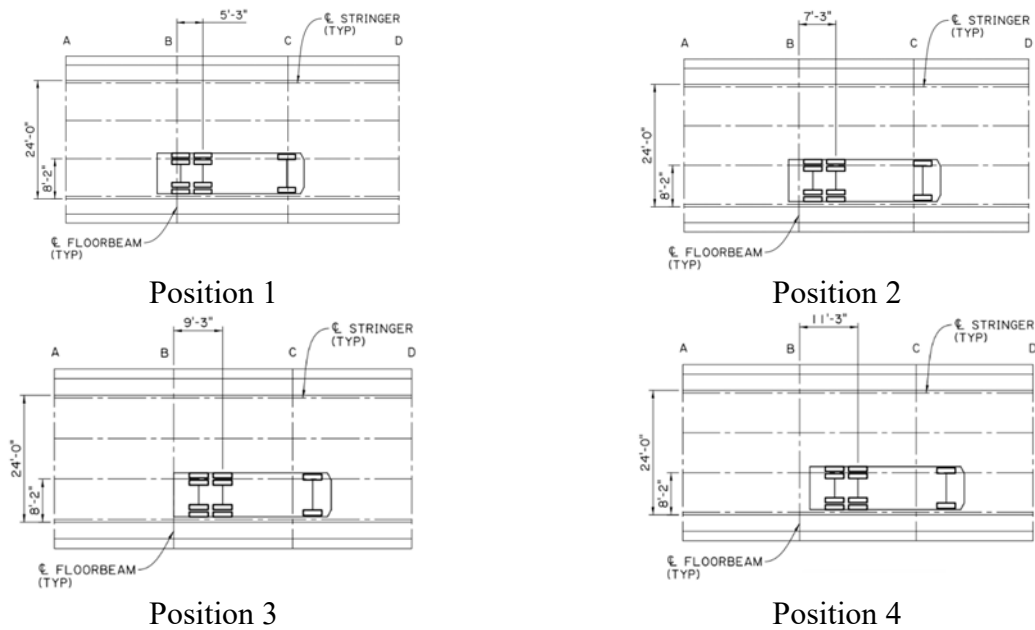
Plan View of Truck Positions for Stringer Longitudinal Loading
